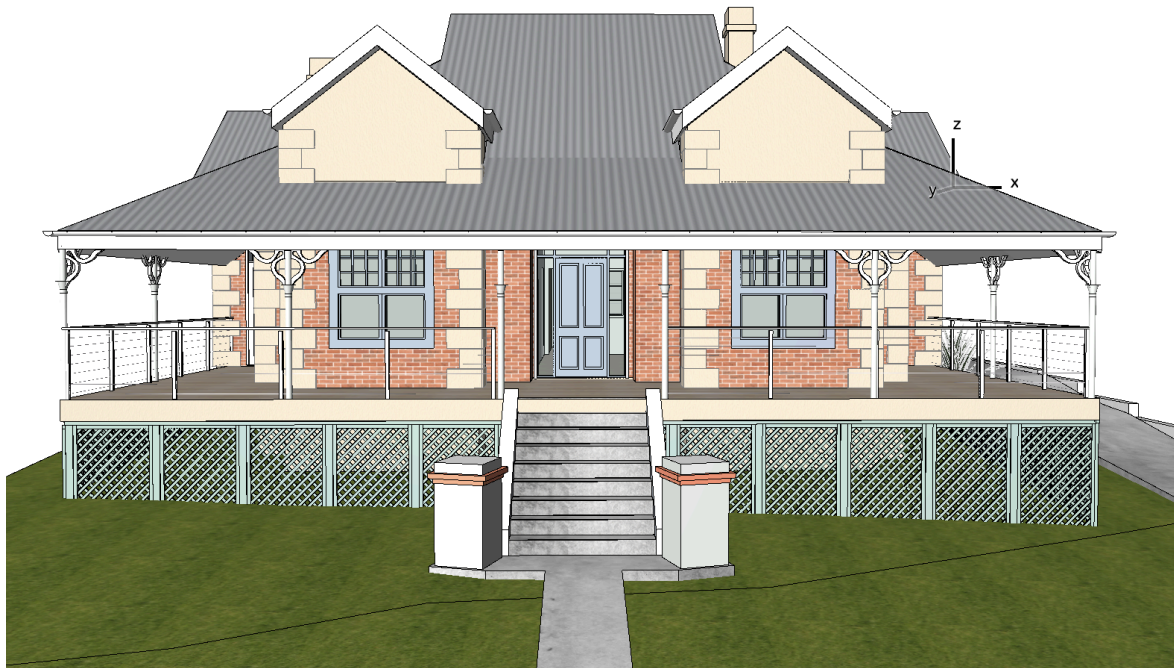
Facade of dwelling after proposed alterations and extension -no changes proposed to facade. (Source: Your Home Designs)
